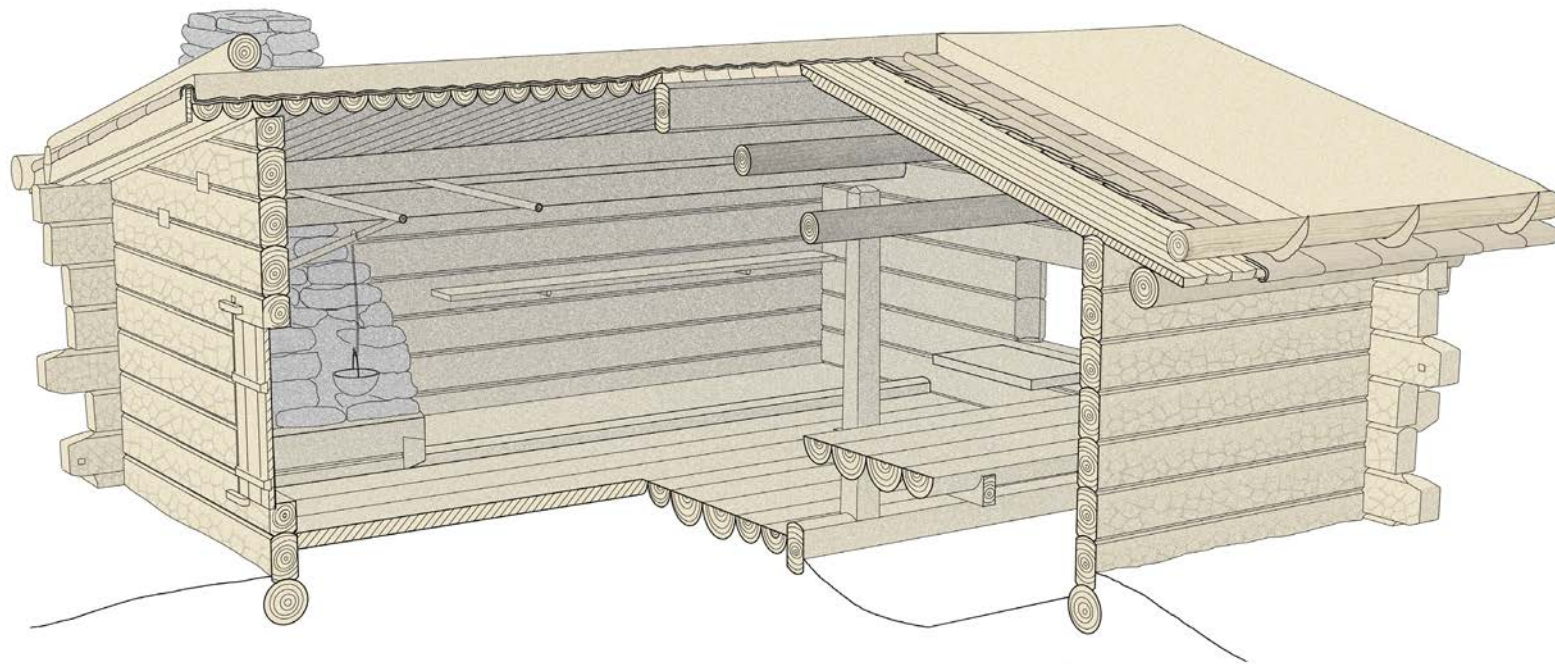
Sámi log house, drawing of section and plan. *Livady*.
